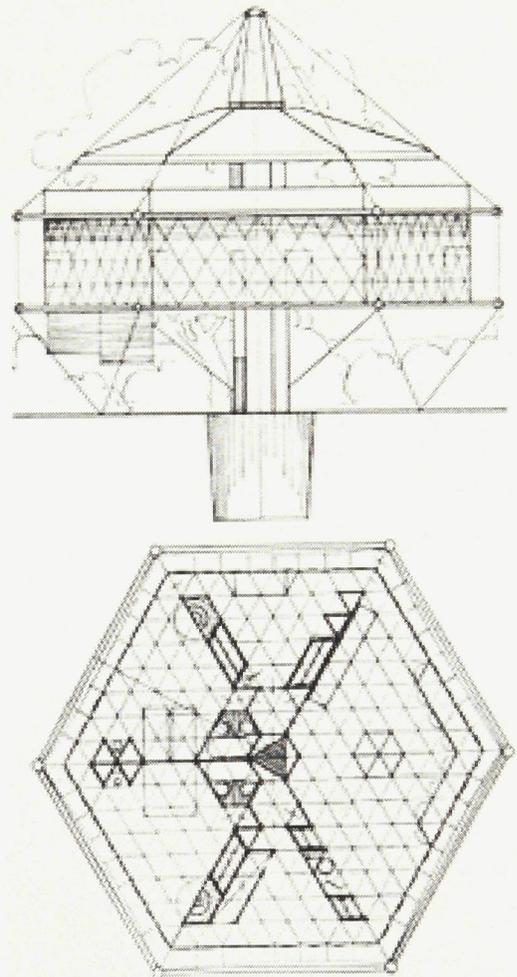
"Elevation and floor plan of the 4D Dymaxion House; 1928." By Buckminster Fuller, note the central services core and open plan public spaces. (Marks, 1960, 80)
